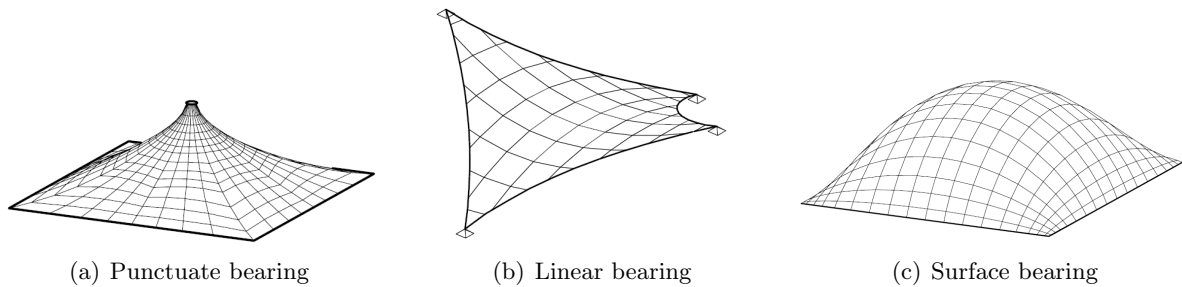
Possible types of bearing of membrane structures [10, p.7]
